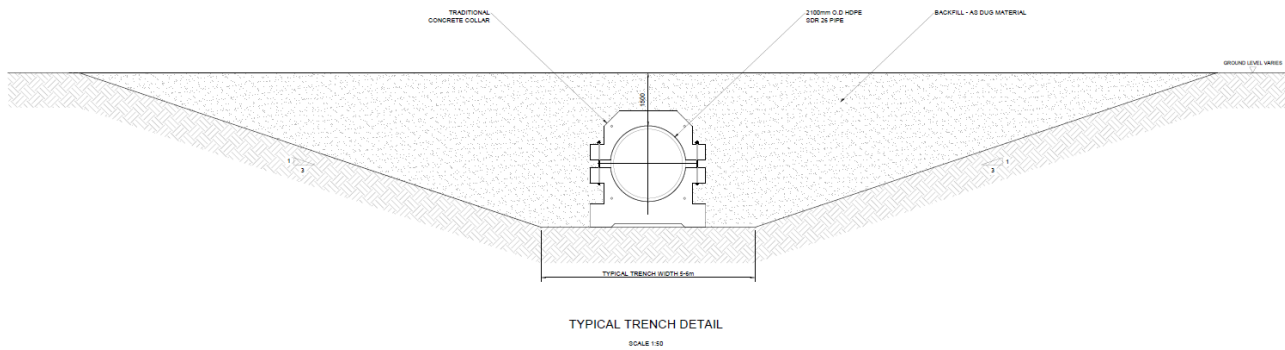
TYPICAL PROFILE FOR THE PIPE TRENCH
